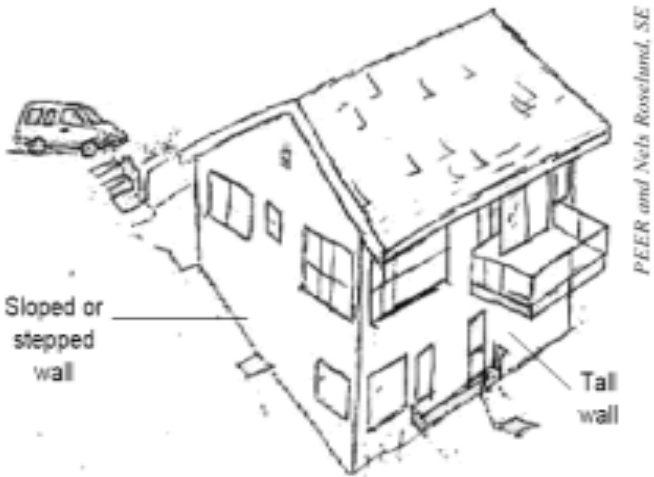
Hillside homes with sloped and tall walls or posts require special engineering.
